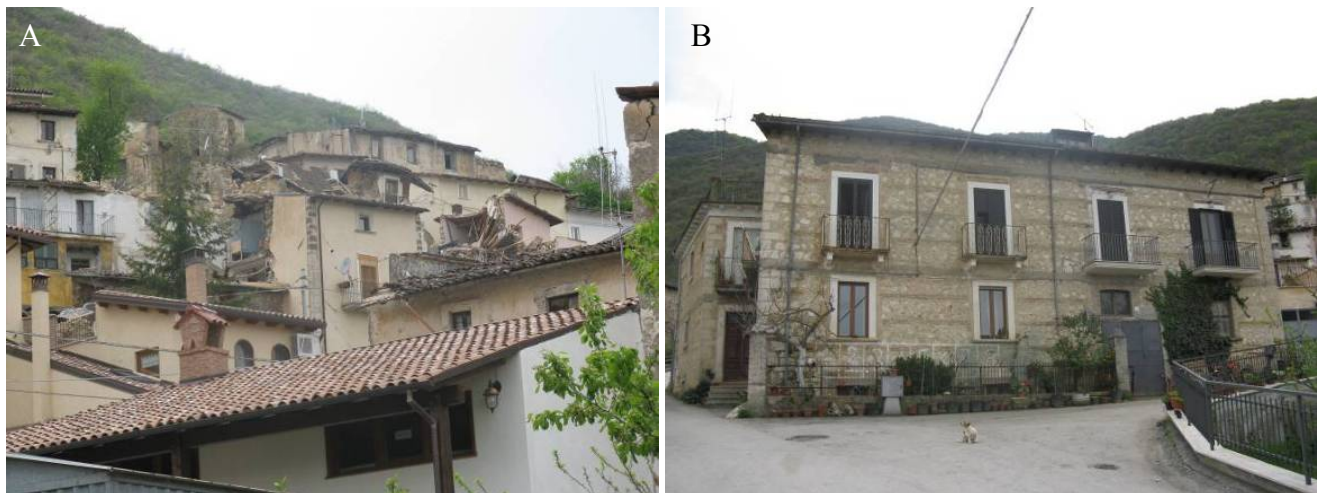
Tussillo. (A) View of the historic center with some collapsed masonry buildings on the background, (B) Masonry building at the entrance of the village showing no damage.
